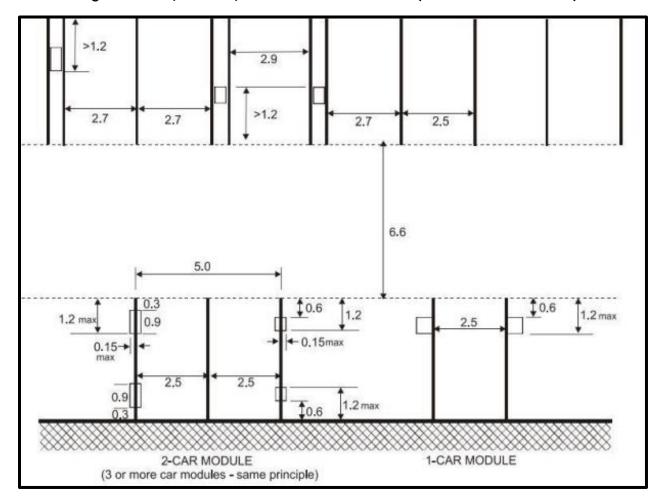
Walls, Columns, and Side Clearance Widths (all dimensions in metres)
